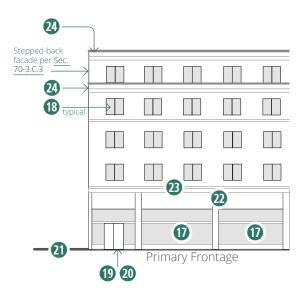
C-4. Storefront Building Elevation: Facade Design Requirements
